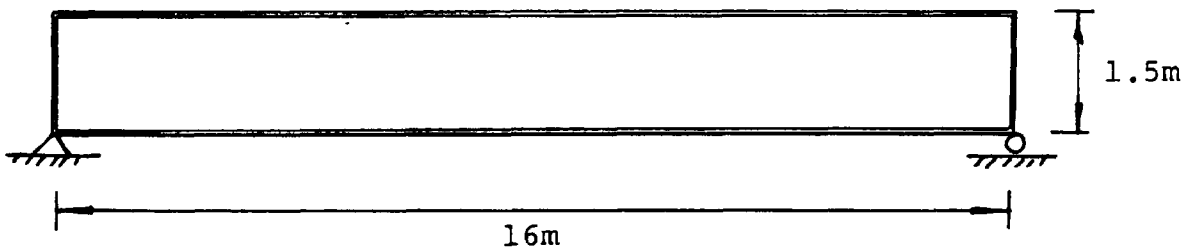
DETAILS OF GRILLAGE BEAM ELEMENT.
